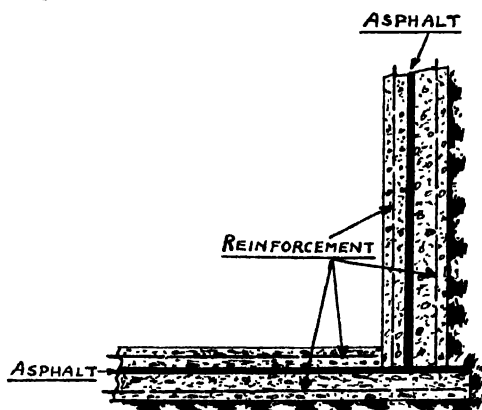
DOUBLE SHELL TANK CONSTRUCTION
